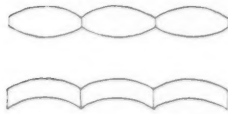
Top: cross section of double shell construction as originally devised. Bottom: cross section finally used.
